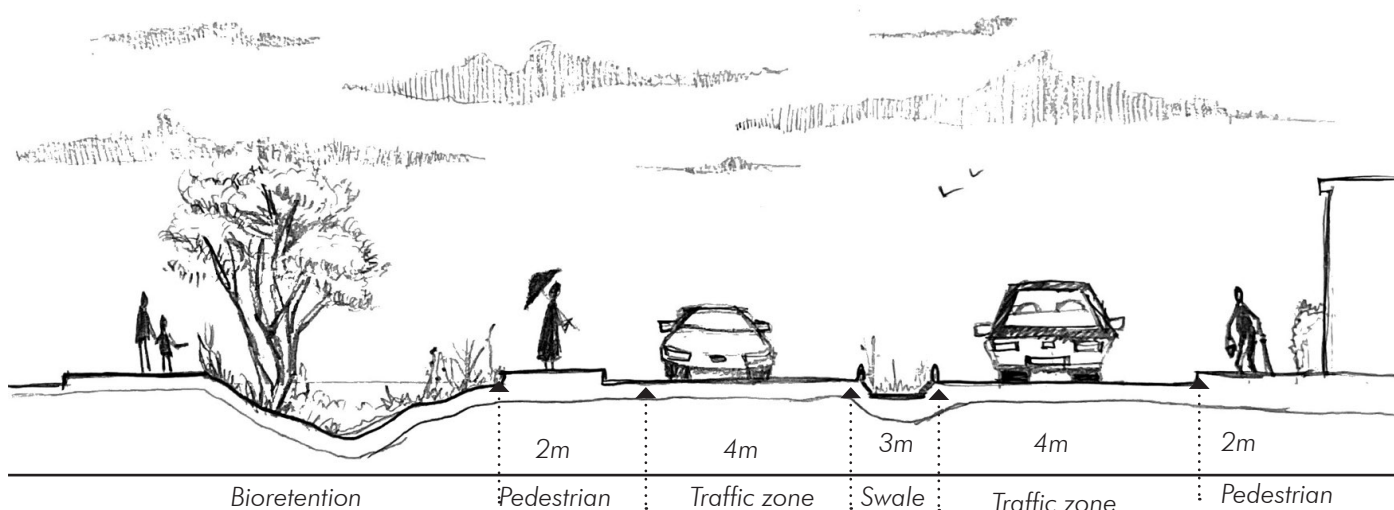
Street E section of a 15m wide road with a bioretention area acting as a buffer between the main street and the Royal village project residential area
